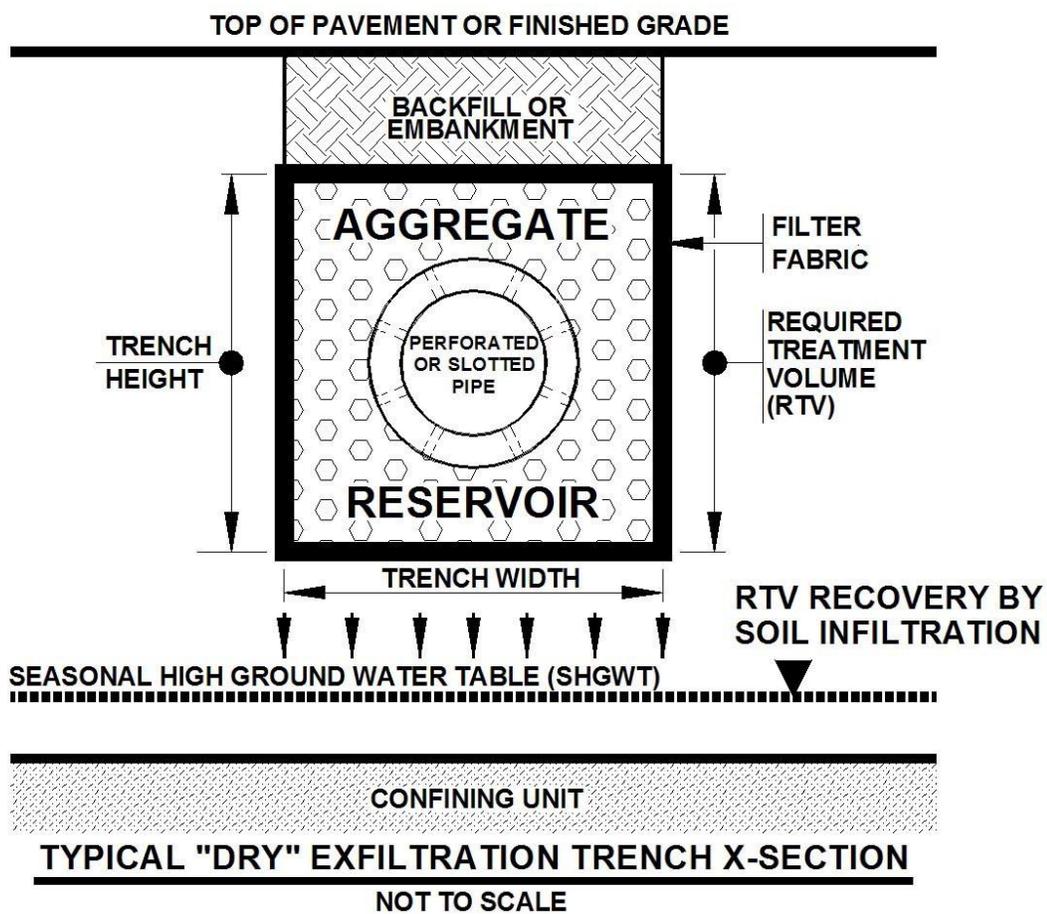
Cross-section of a “DRY” Exfiltration Trench (N.T.S.)
